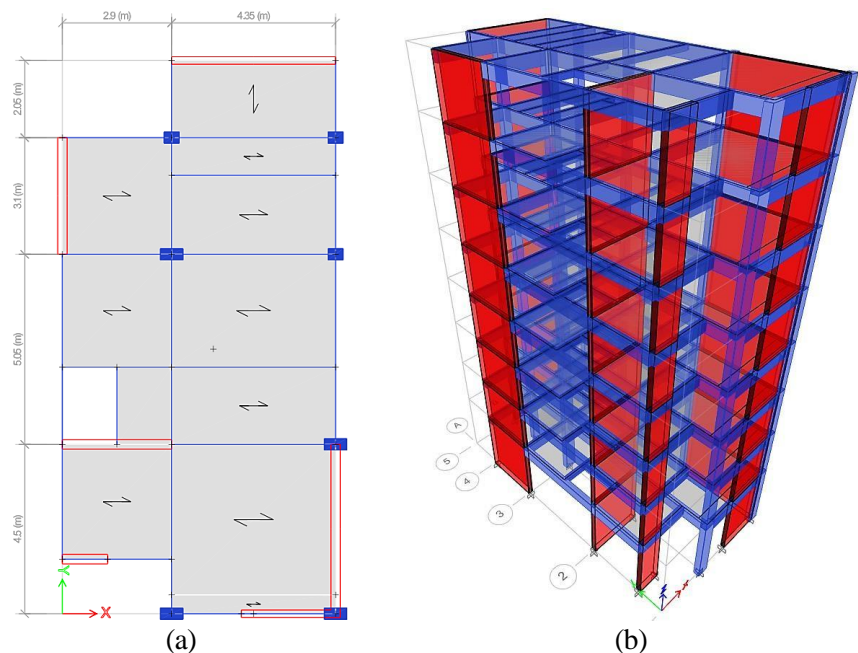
(a) Plan view of the fixed base building. (b) Modeling of the fixed base building.
